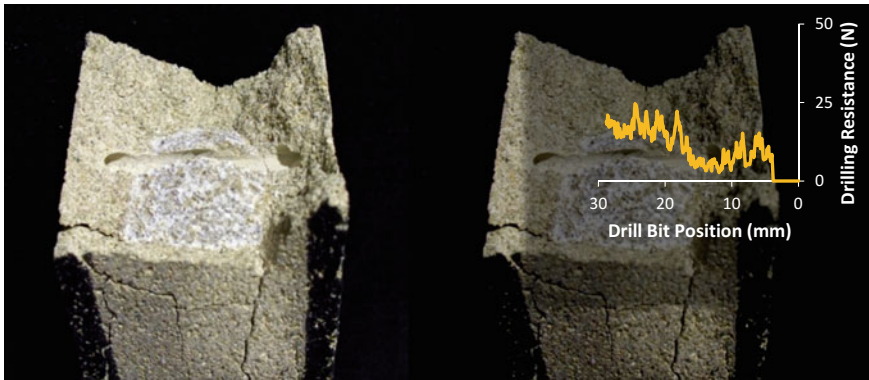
Left* Horizontal section through the test specimen at the position of drill hole nr. 3. *Right* DRMS pattern from drill hole nr. 3 superimposed on photograph at location of drill hole
